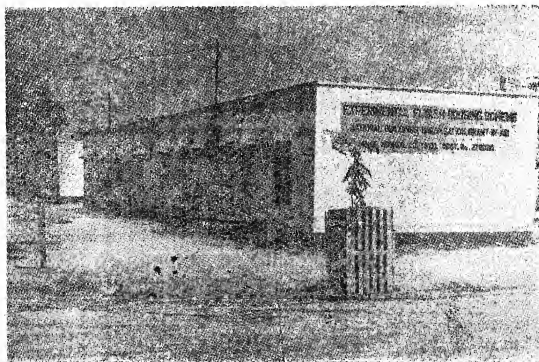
PHOTO No. IV HOUSES CONSTRUCTED WITH FLYASH
